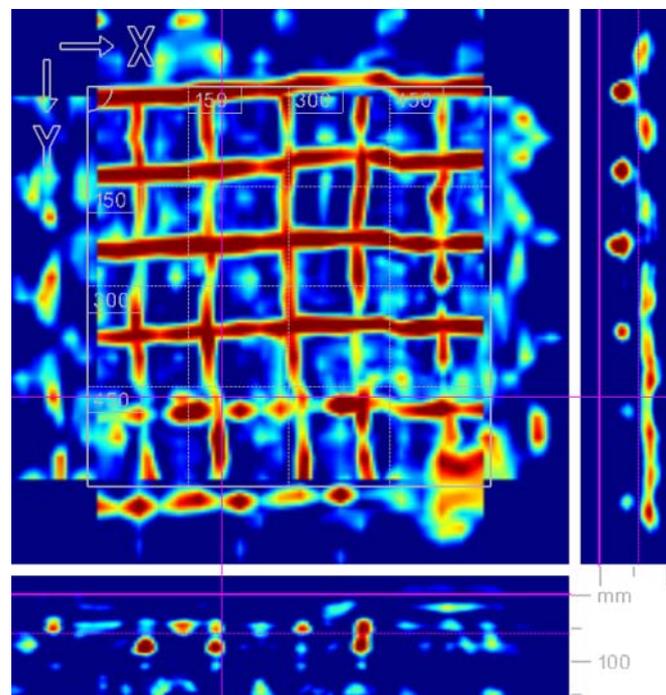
Srod miescie WKD Station Pavilion deck X-Scan measurement, showing reinforcement mesh and concrete covering. Source: INES Ingenieros 2018.
